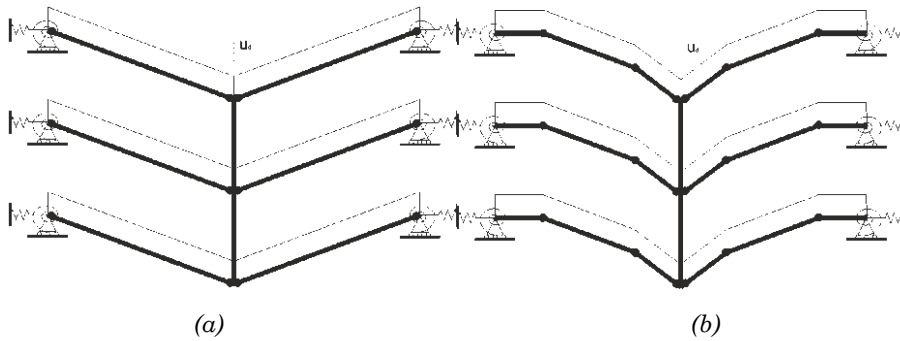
Typical deformation modes due to column loss in steel (a) and RC (b) frame structures.
